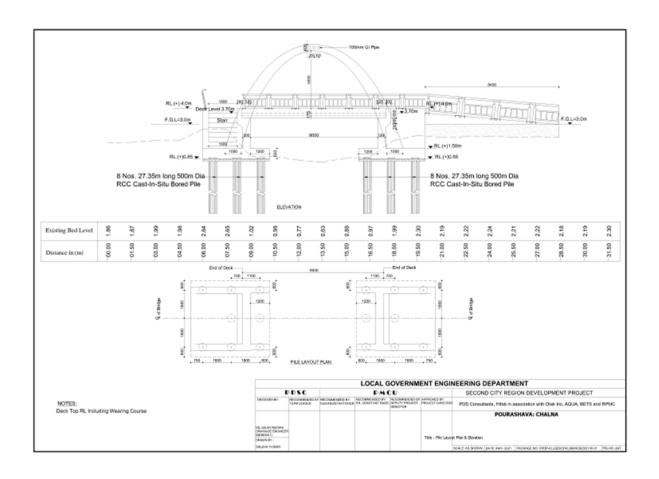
Scheme 11 (Bridge-5): Construction of 14m bridge at Ch. 450m on Boro Kholisha khal
